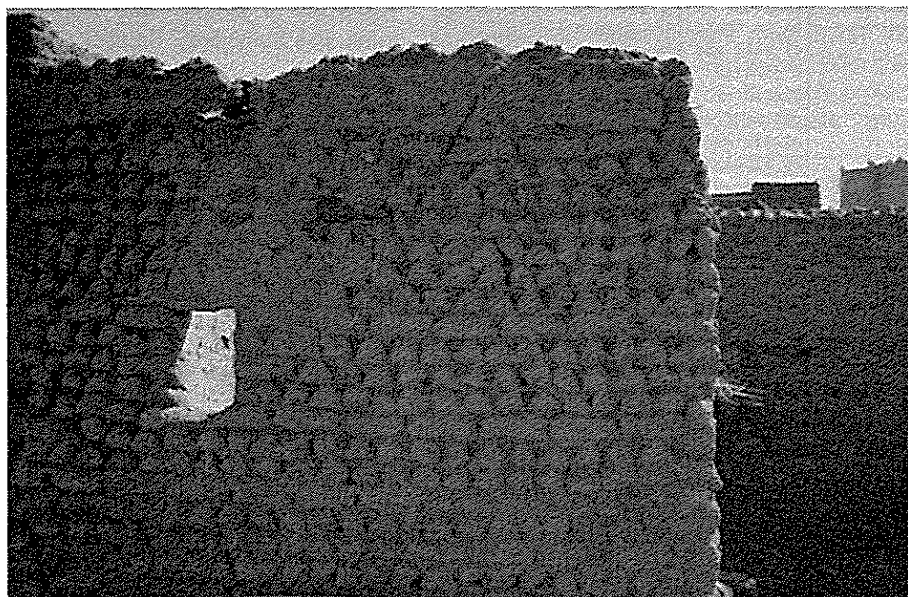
An old wall built with local, hand-made mud bricks laid in a remarkable pattern. Note the small window with a willow branch, probably one of several composing the lintel.
